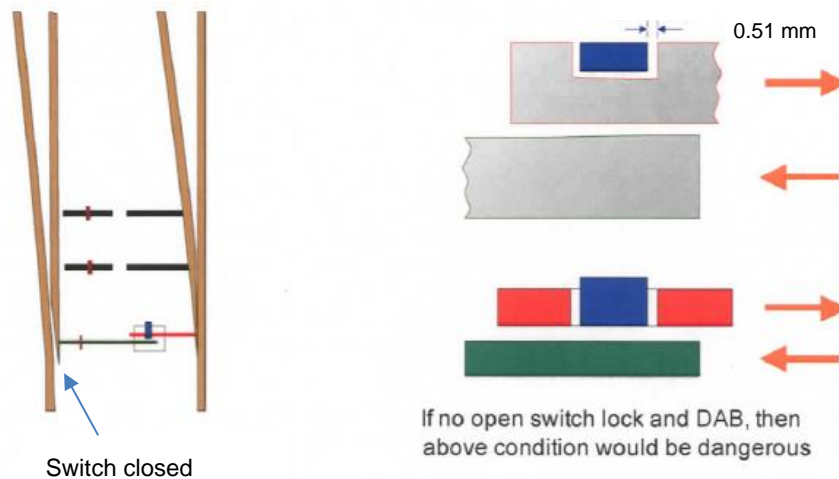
Facing point lock with broken stretcher bars and open switch lock disengaged (adapted from [27, p.44])
